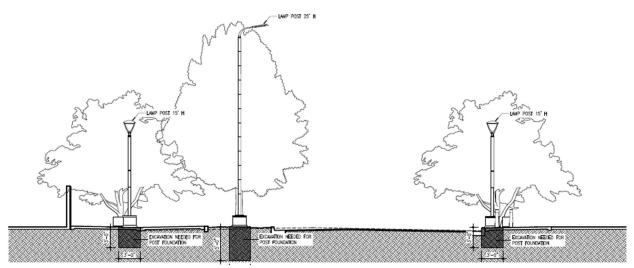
Detail of Lamp Posts impact on soil–ROSSILUGO
